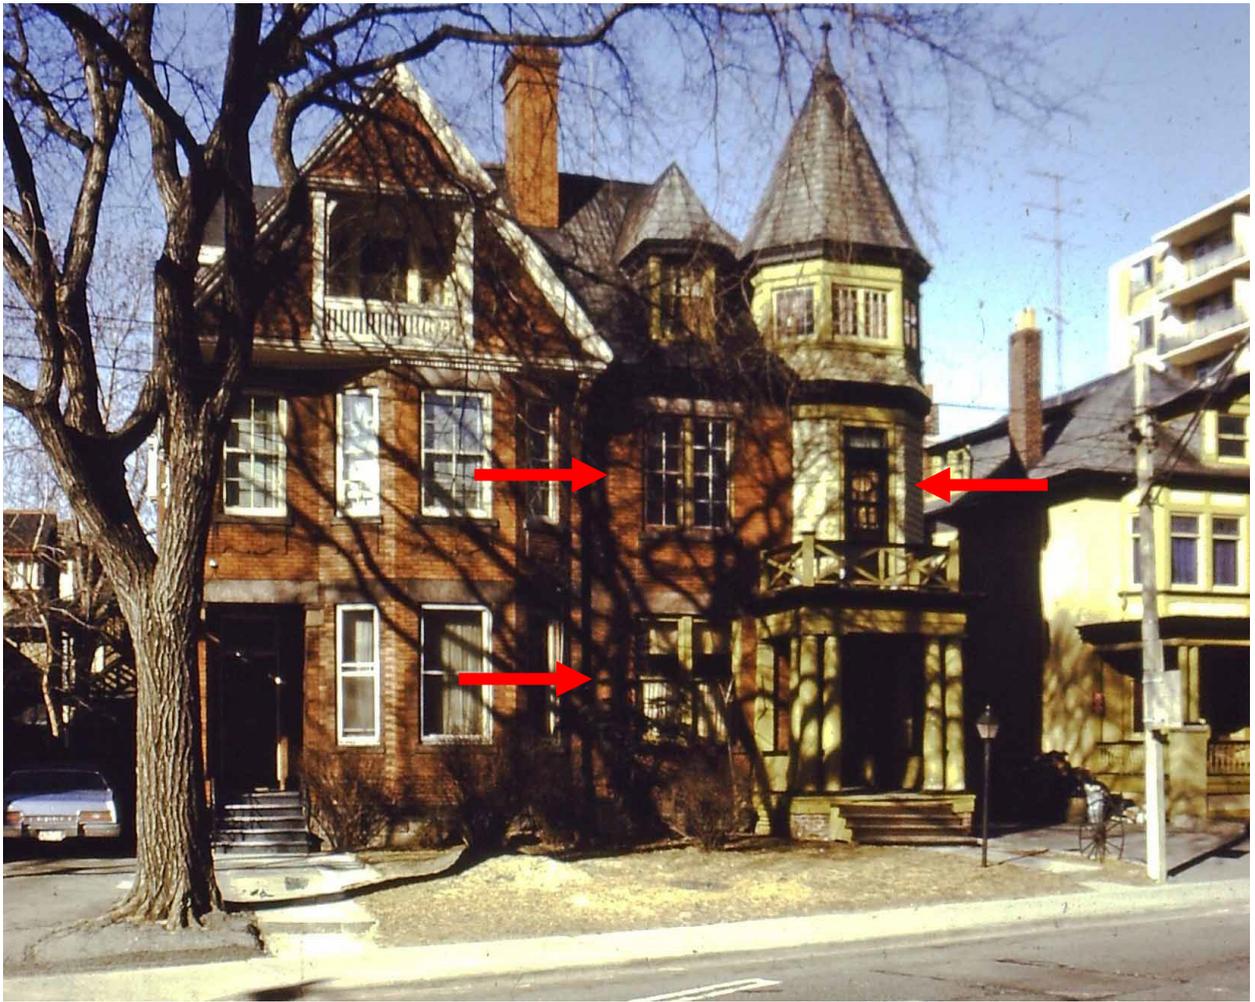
1974 image showing previously existing window openings and door opening on the main (east) elevation of 264 St. George Street (CTA).
